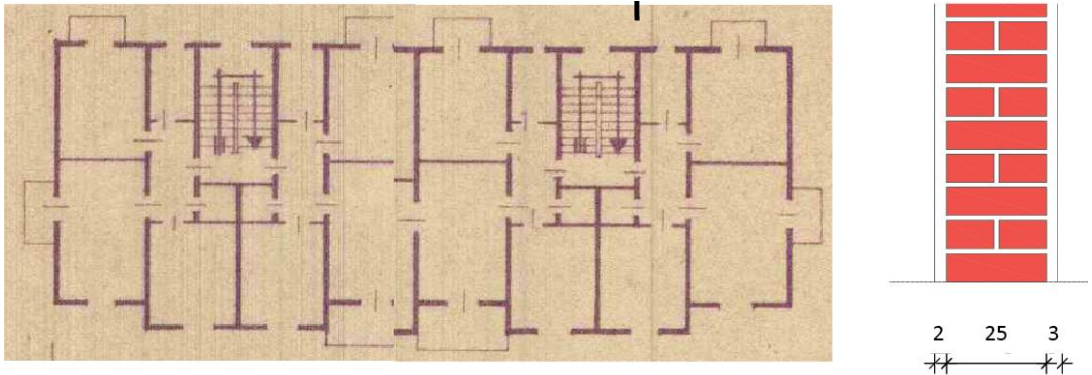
The first multifamily house plan and detail of the perimetral wall.
